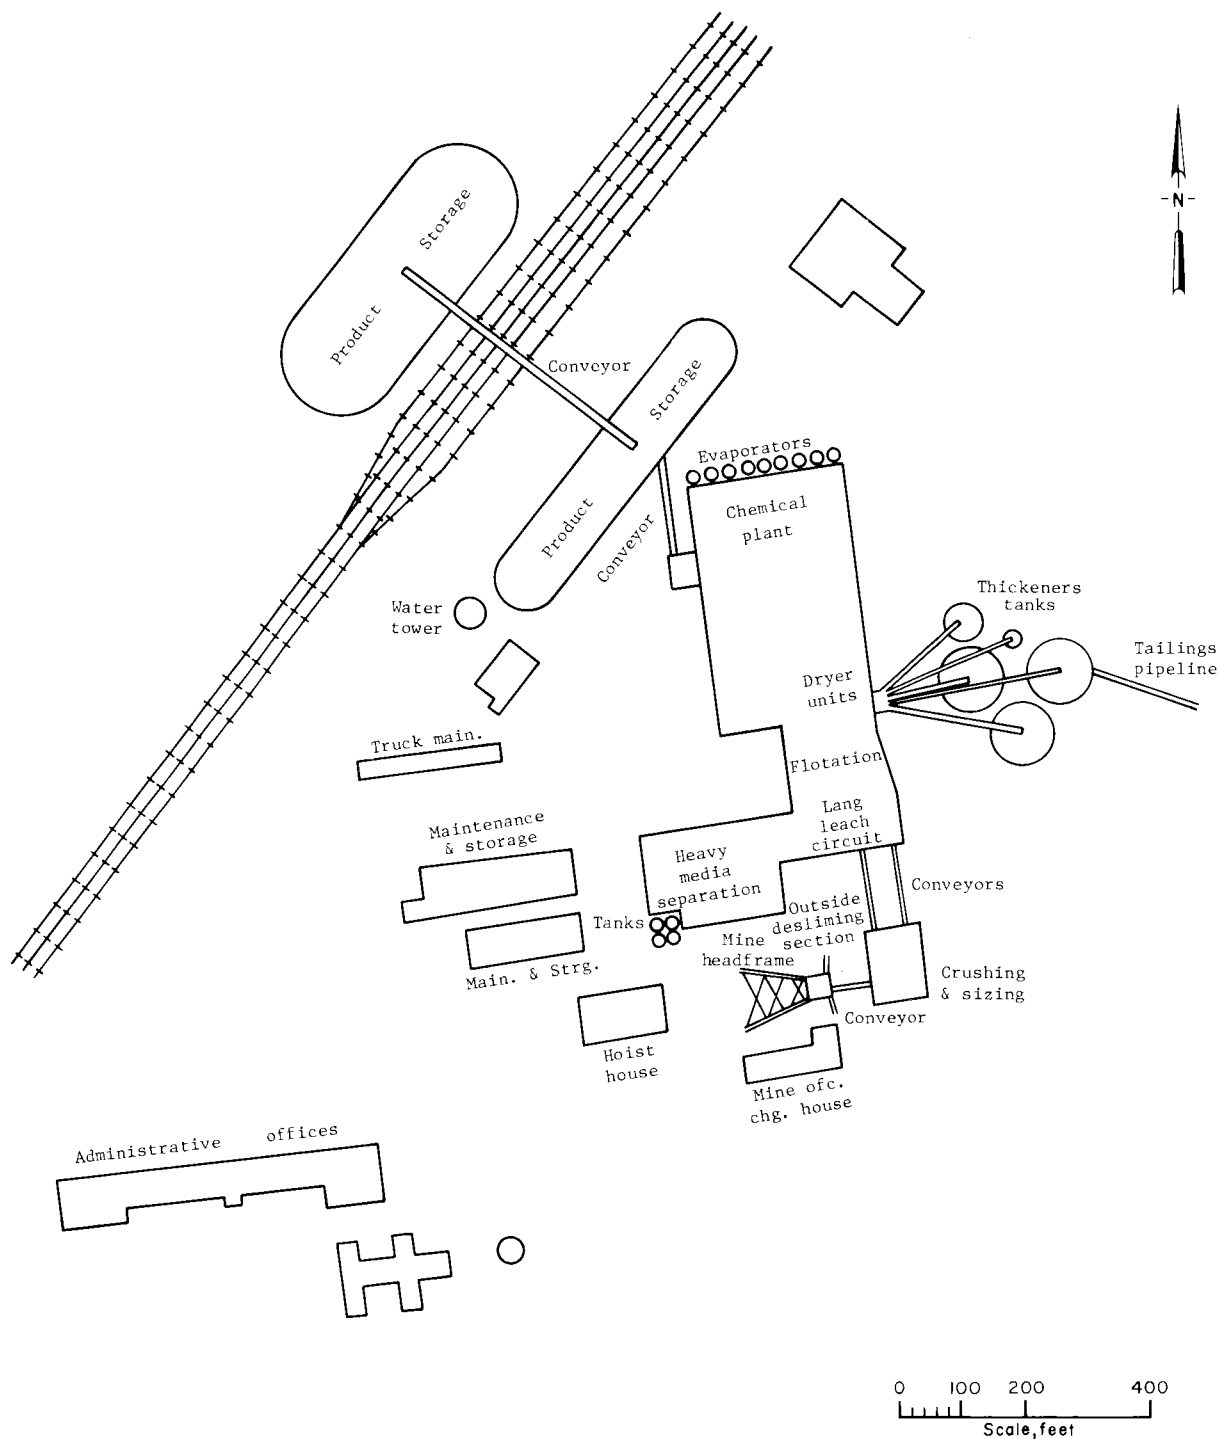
Generalized layout of 13,000-tpd surface plant.
